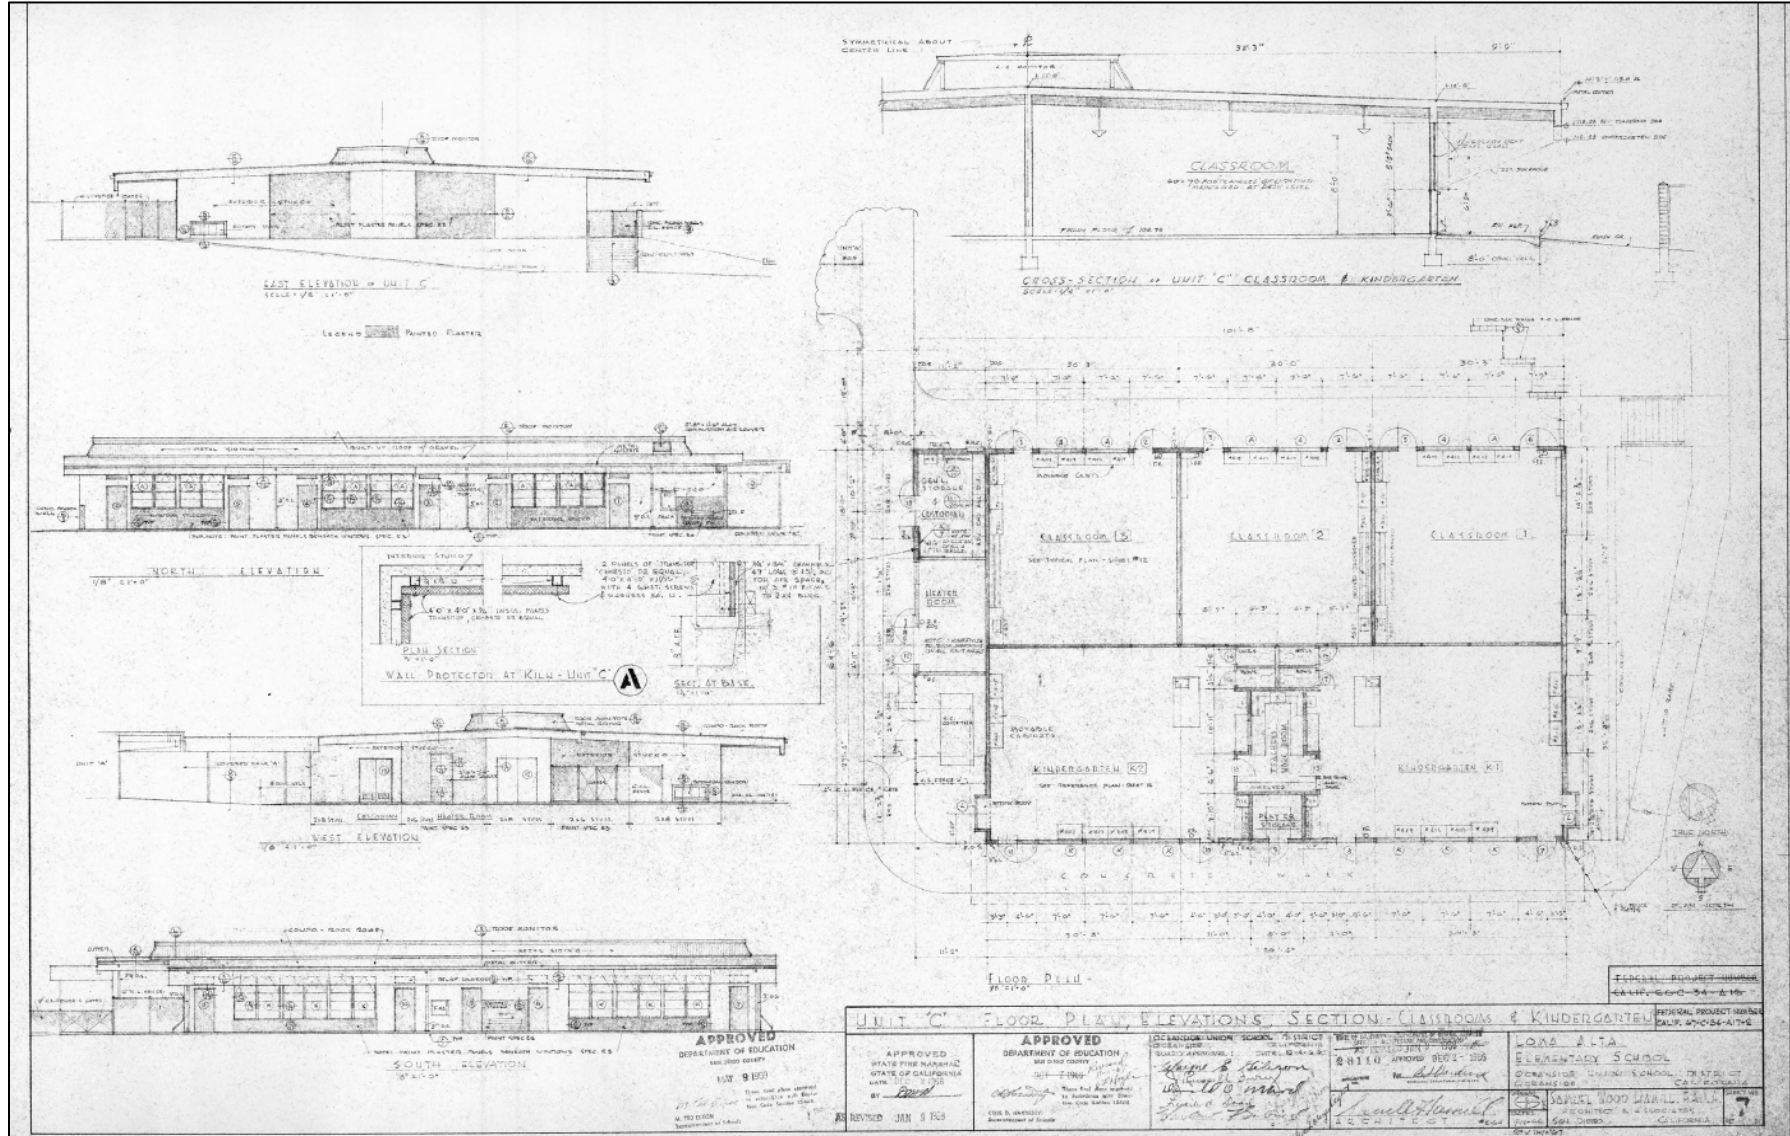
1966 Unit C Floor Plan and Elevations Drawing, Sheet 7. Source: San Diego History Center.
